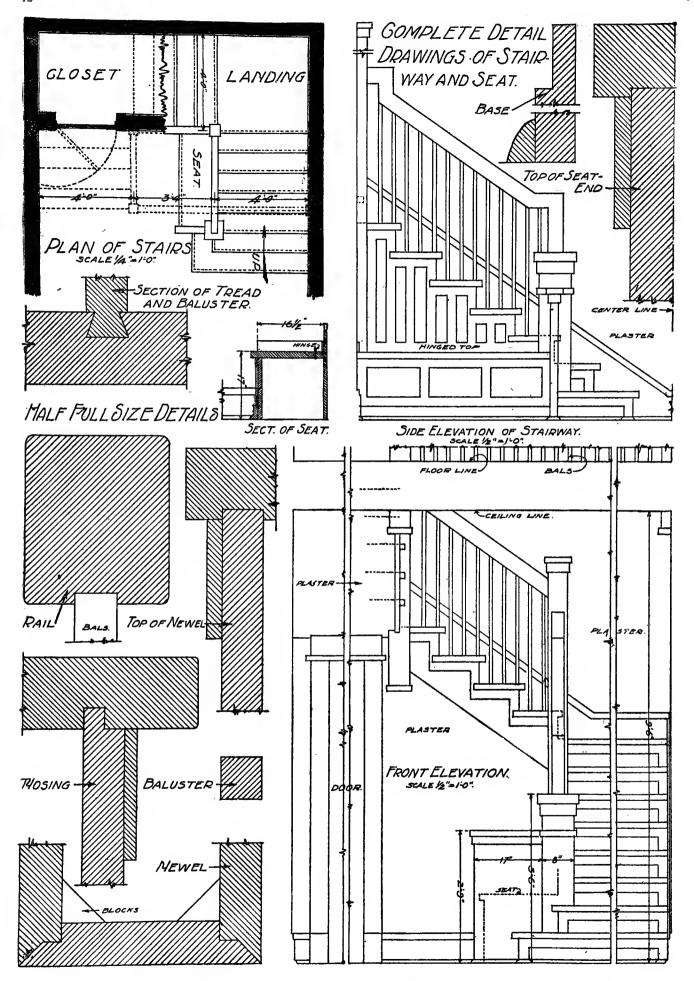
STAIR HALL IN THE MODERN STRAIGHT-LINE STYLE
